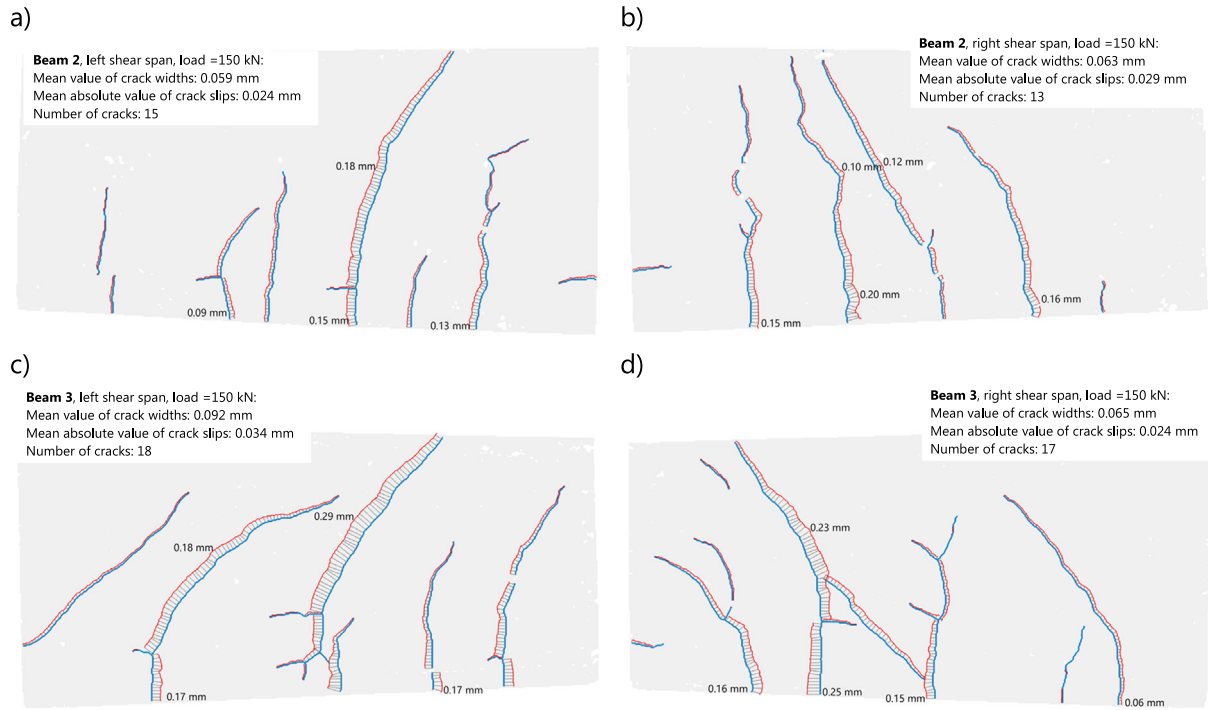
Crack patterns and widths of the beams at a load of 150 kN: a) and b) Beam 2 (three prestressed stirrups), c) and d) Beam 3 (three non-prestressed stirrups).
